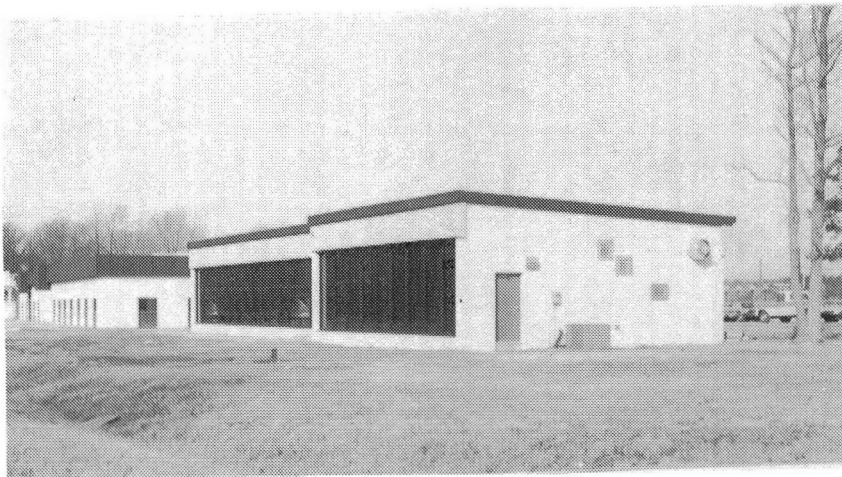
PHOTO OF FRONT AND EAST WALL SHOWING
